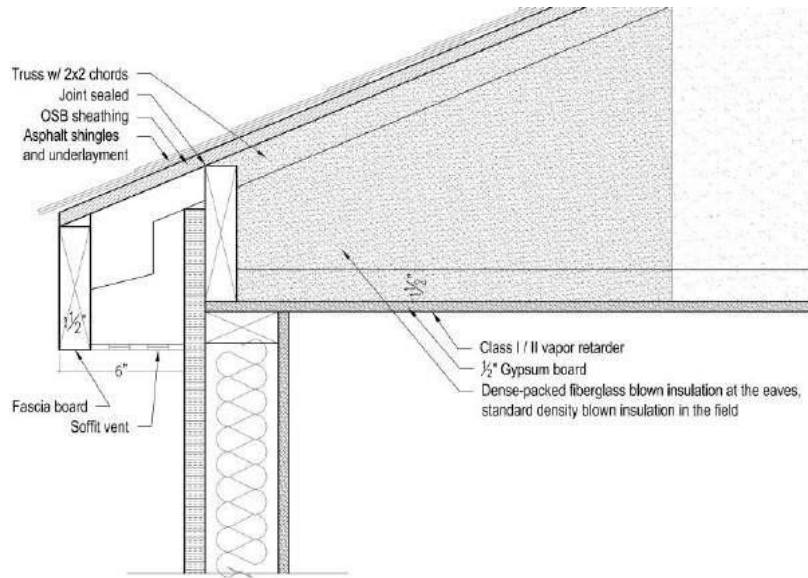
Design 4 - Eave and Ridge Detail (Double-Section Construction)
